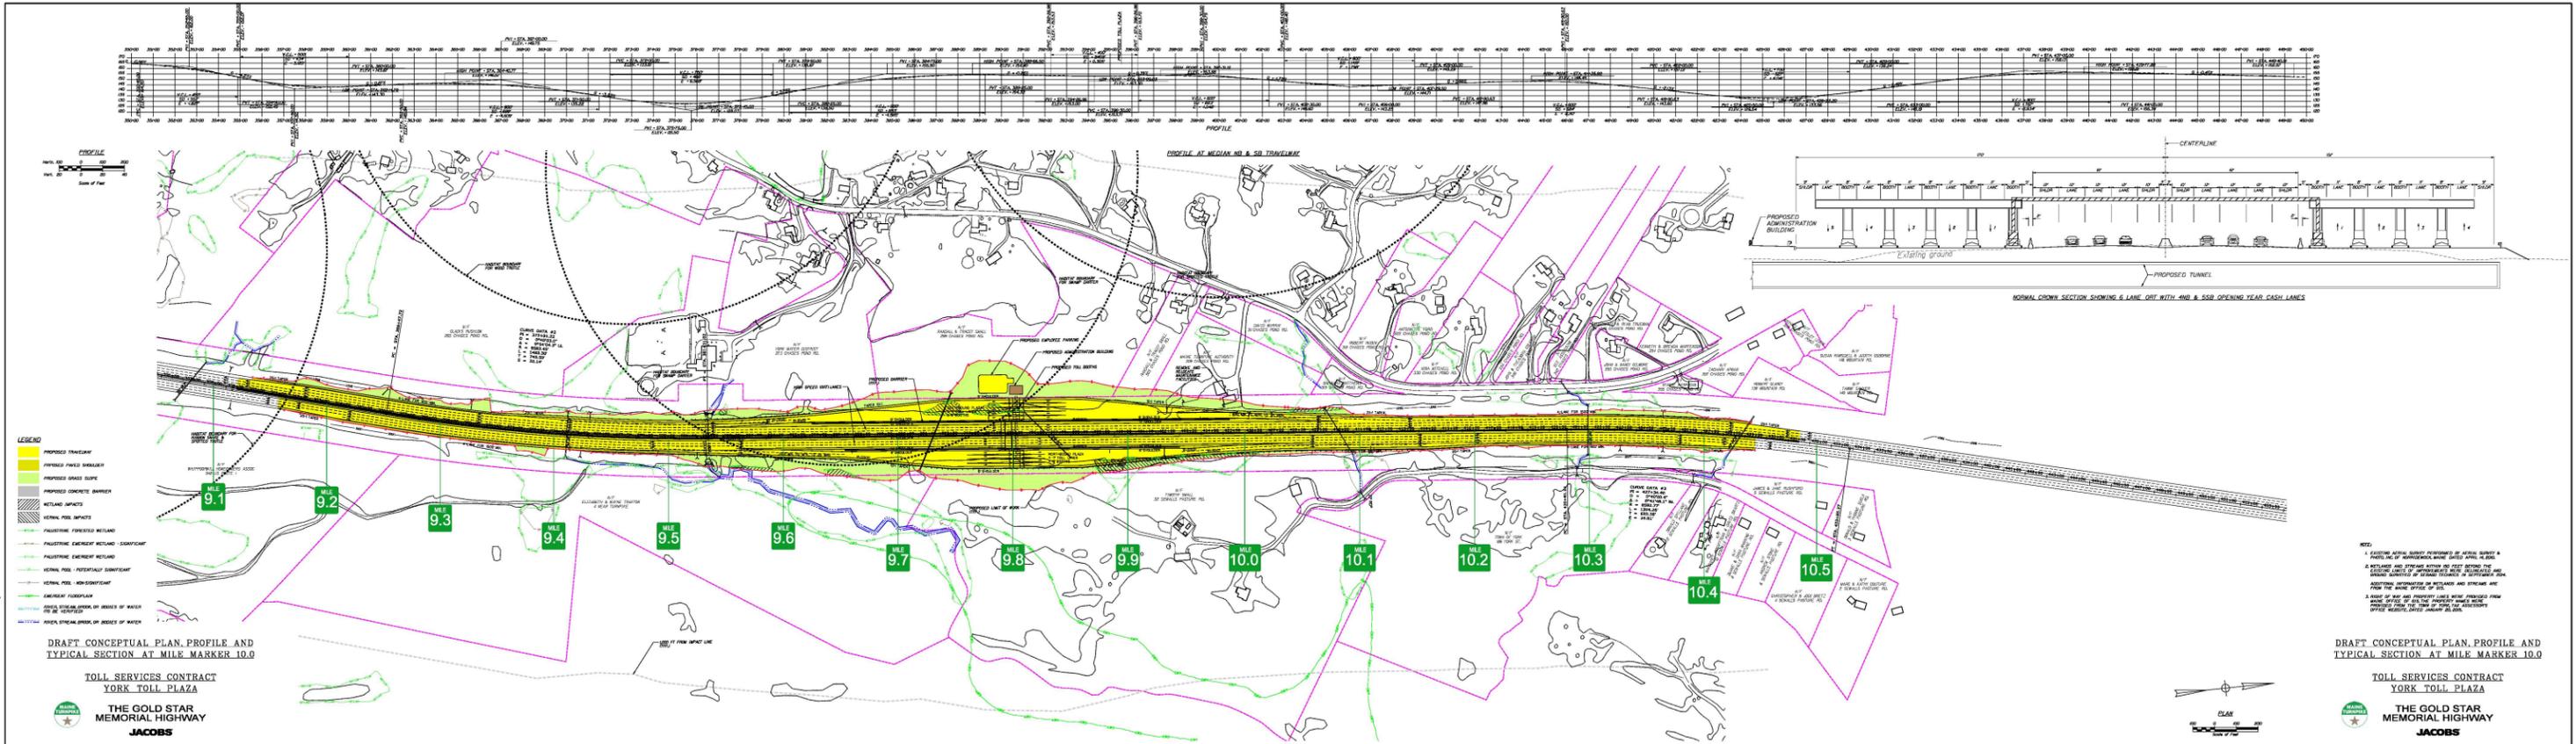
Conceptual Plan, Profile and Typical Section at Mile 10.0
